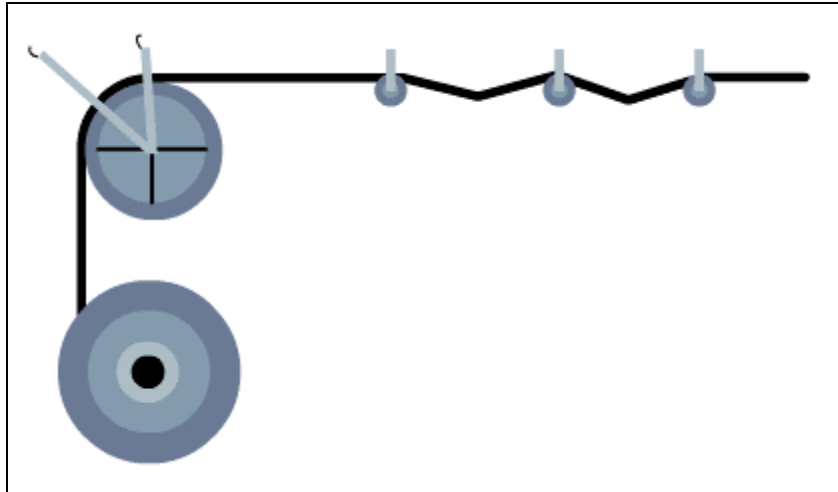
Cable Pull Using a Bullwheel and Pulleys
